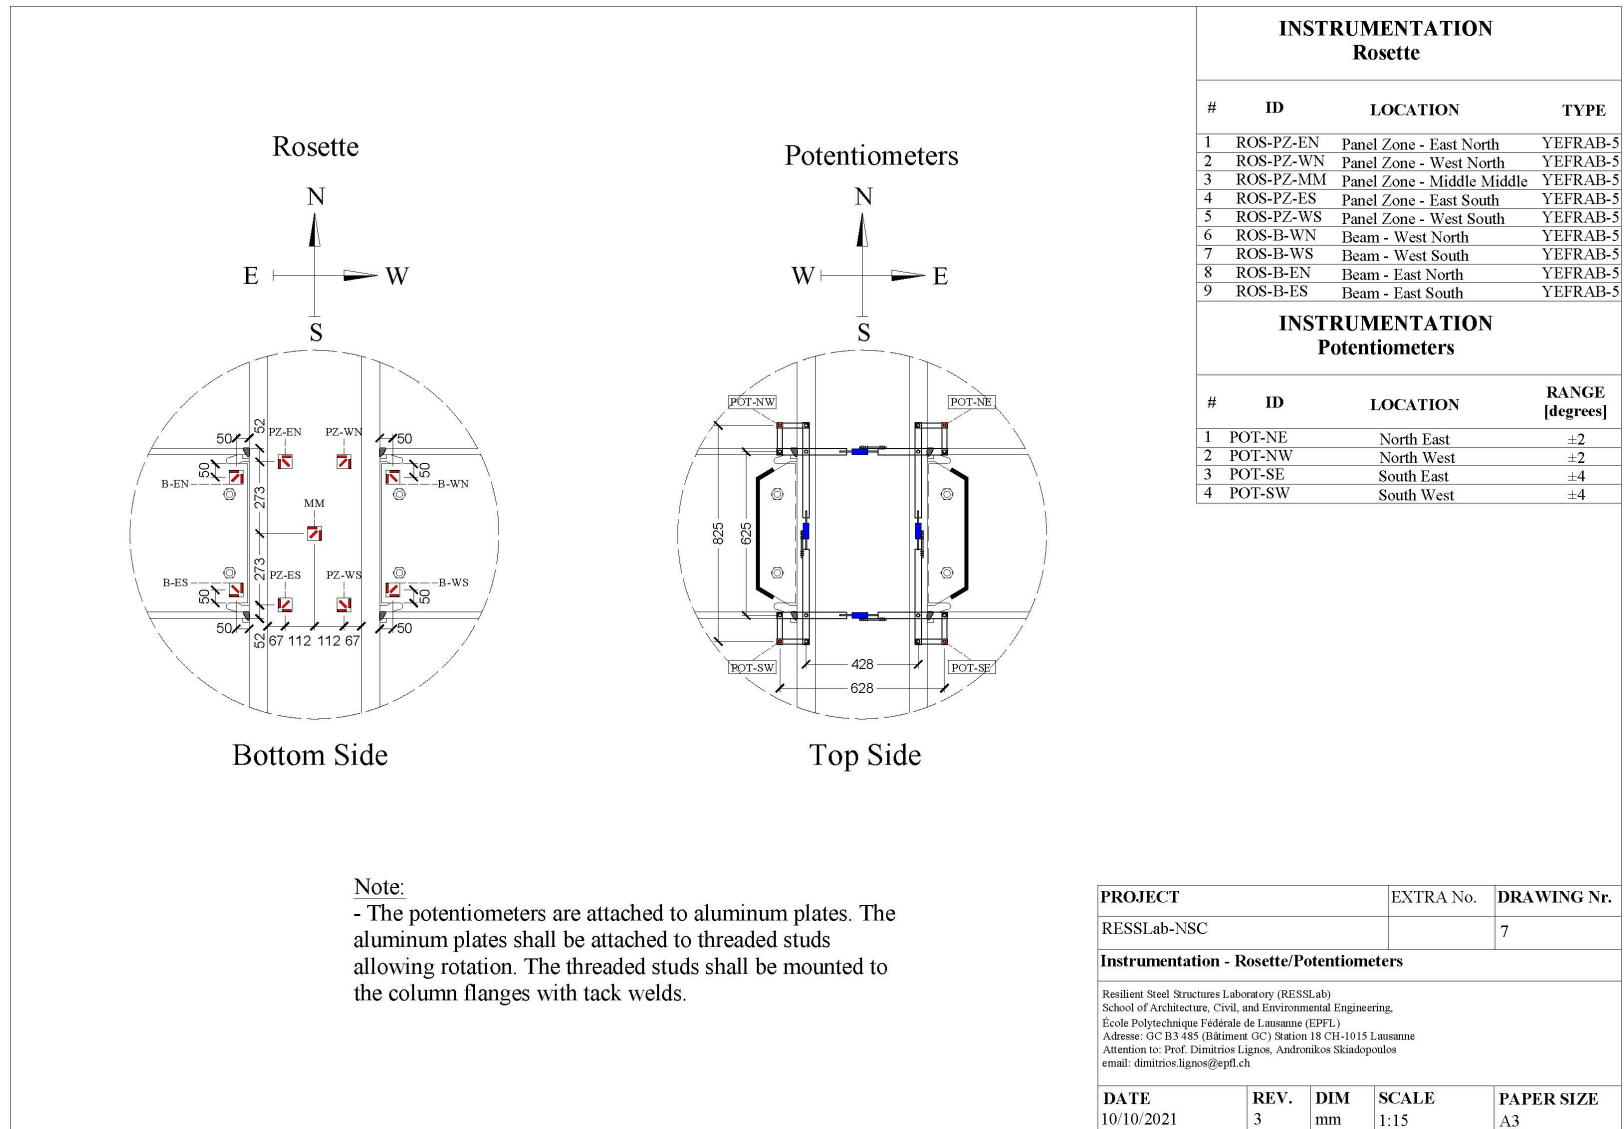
Instrumentation plan – Rosette and potentiometer drawings.
